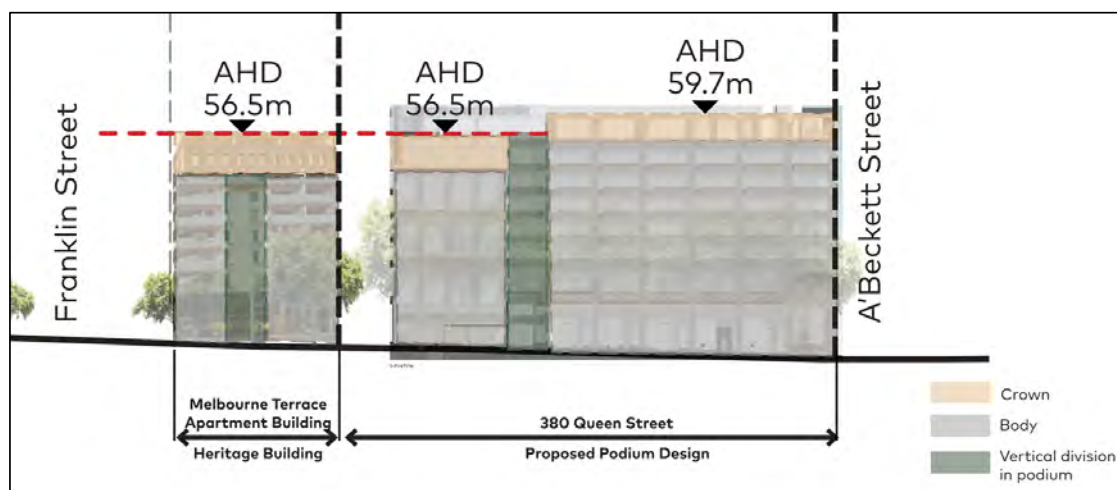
Street wall design response to Queen Street (Source: Applicant dated June 2025)
